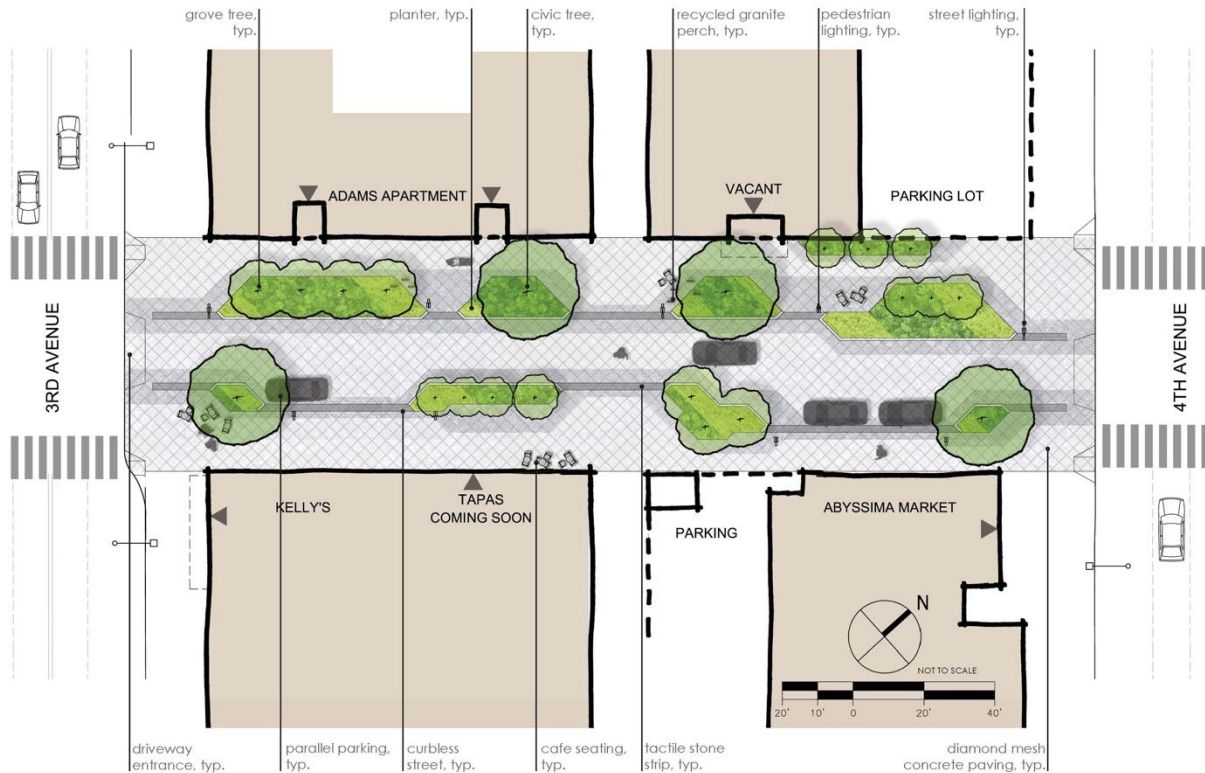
Plan of Bell Street Park. Image from NACTO and SvR Design.
